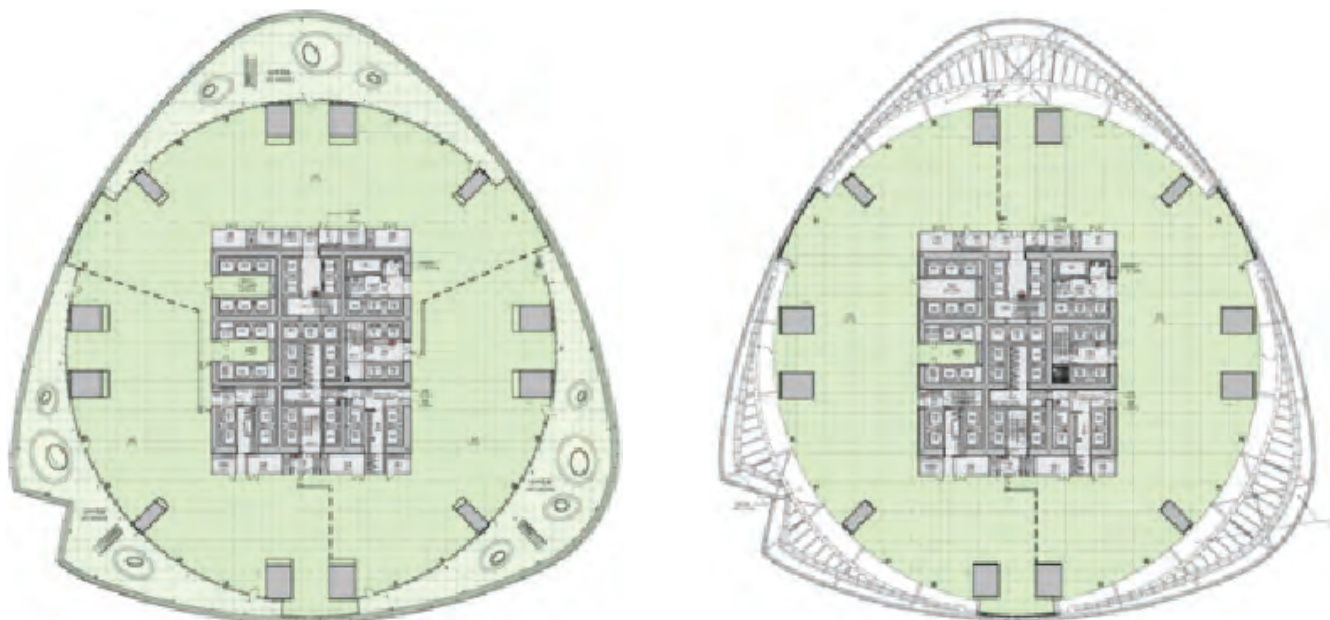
A typical floor plate for Shanghai Tower (Source: Gensler)
